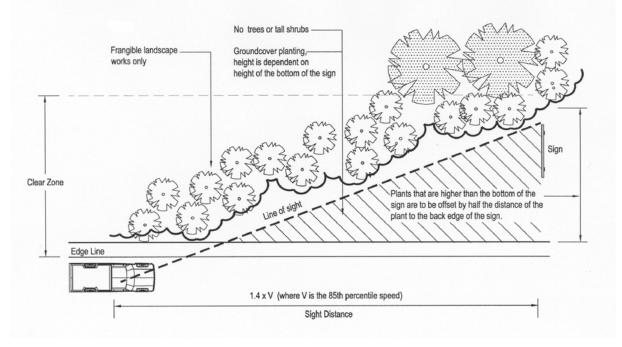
Restrictions on planting to allow sight distance to signage – Plan
